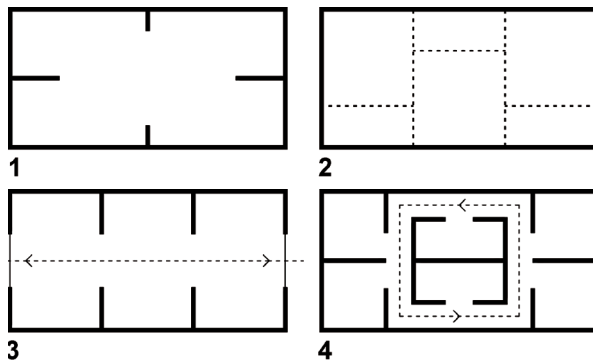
Achieving spatiality through space configuration: 1) open plan, 2) spatial flexibility, 3) enfilade, and 4) circular connection (Source: Authors' drawing)
